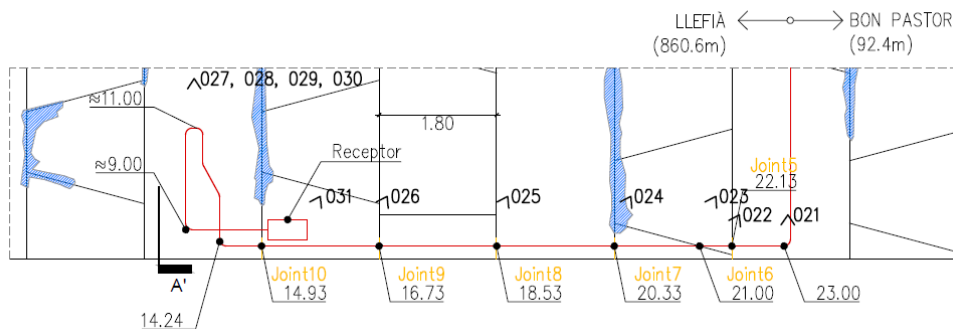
Discontinuities in longitudinal tunnel segment of fiber layout (from Annex 1)
